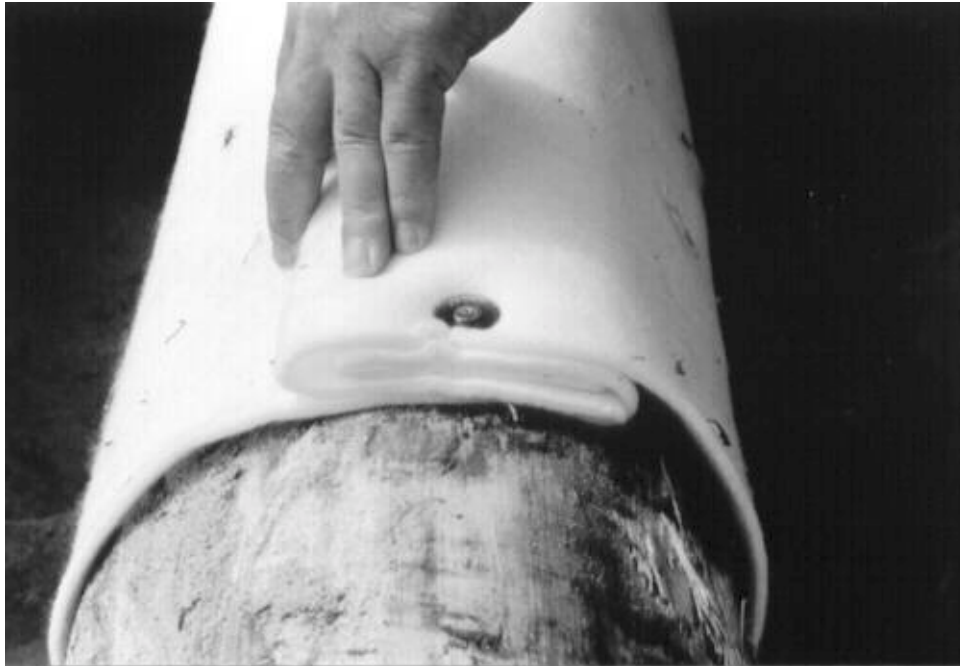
Joint of geotextile cover fixed by stainless steel screw
